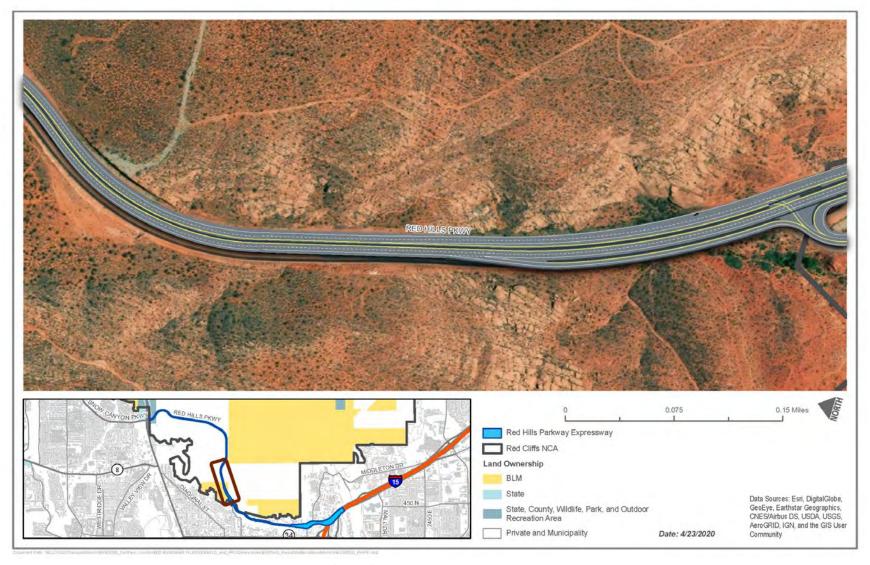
Red Hills Parkway Expressway Plan View (4 of 7)
